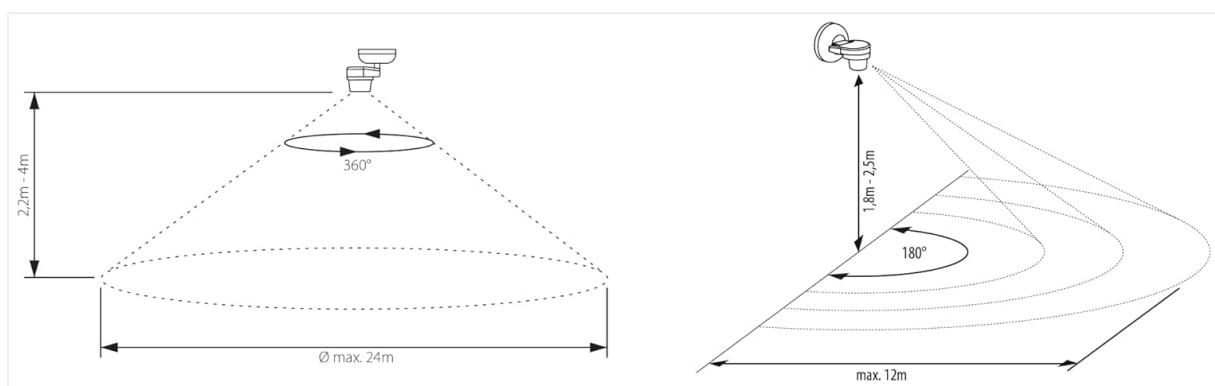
Detection range and angle variations for ceiling and wall installations.
